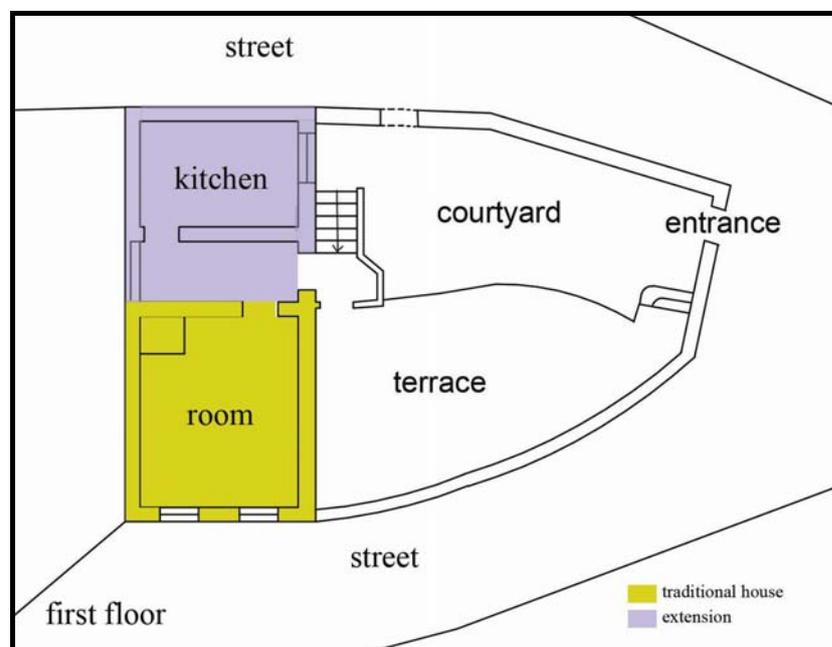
Plan showing additional spaces. (Appendix B: Cadastral Map, 111/9)
